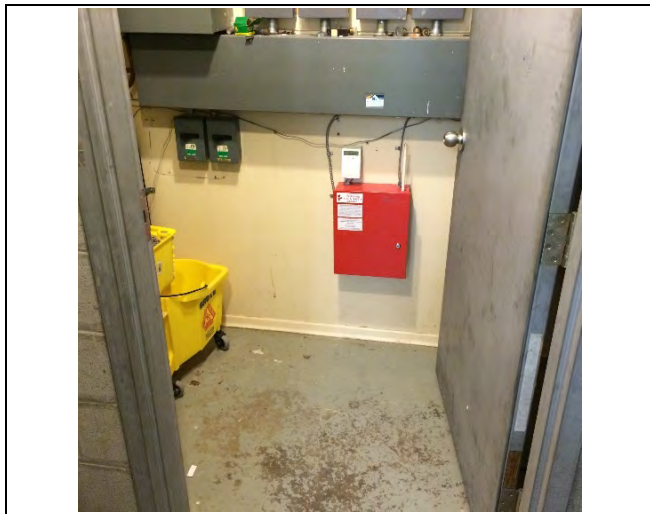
Fire rated door – metal is presumed to be asbestos-containing.
